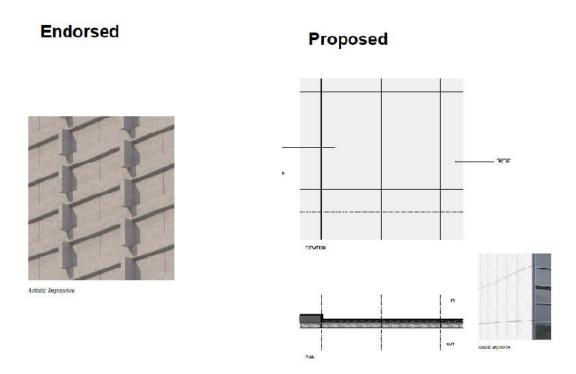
Endorsed and proposed material application to the western elevation of the southern tower.
